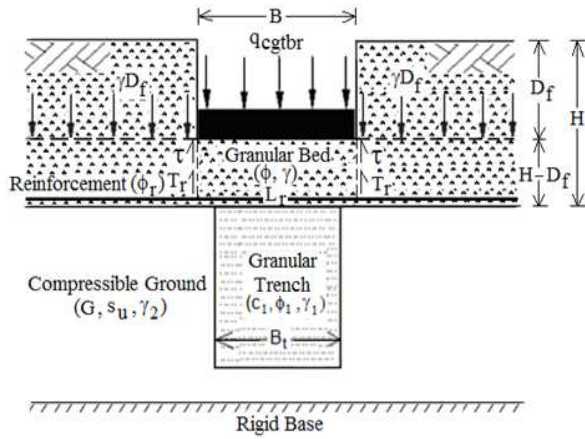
Definition sketch of strip footing on reinforced granular bed over compressible ground with granular trench
